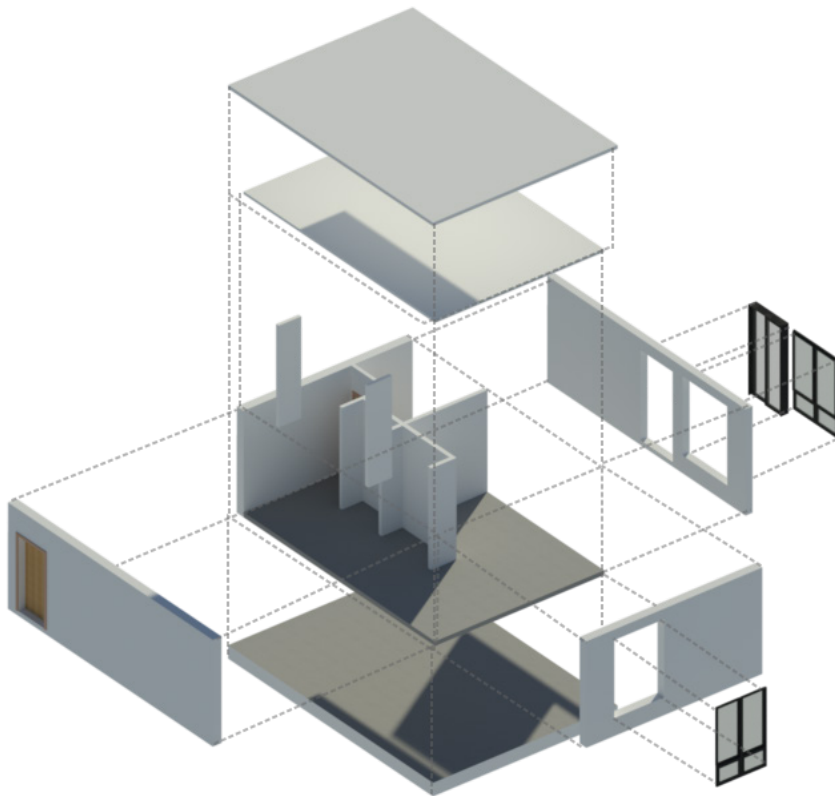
3D model shows an exploded view of module D1, with window openings on two sides.
